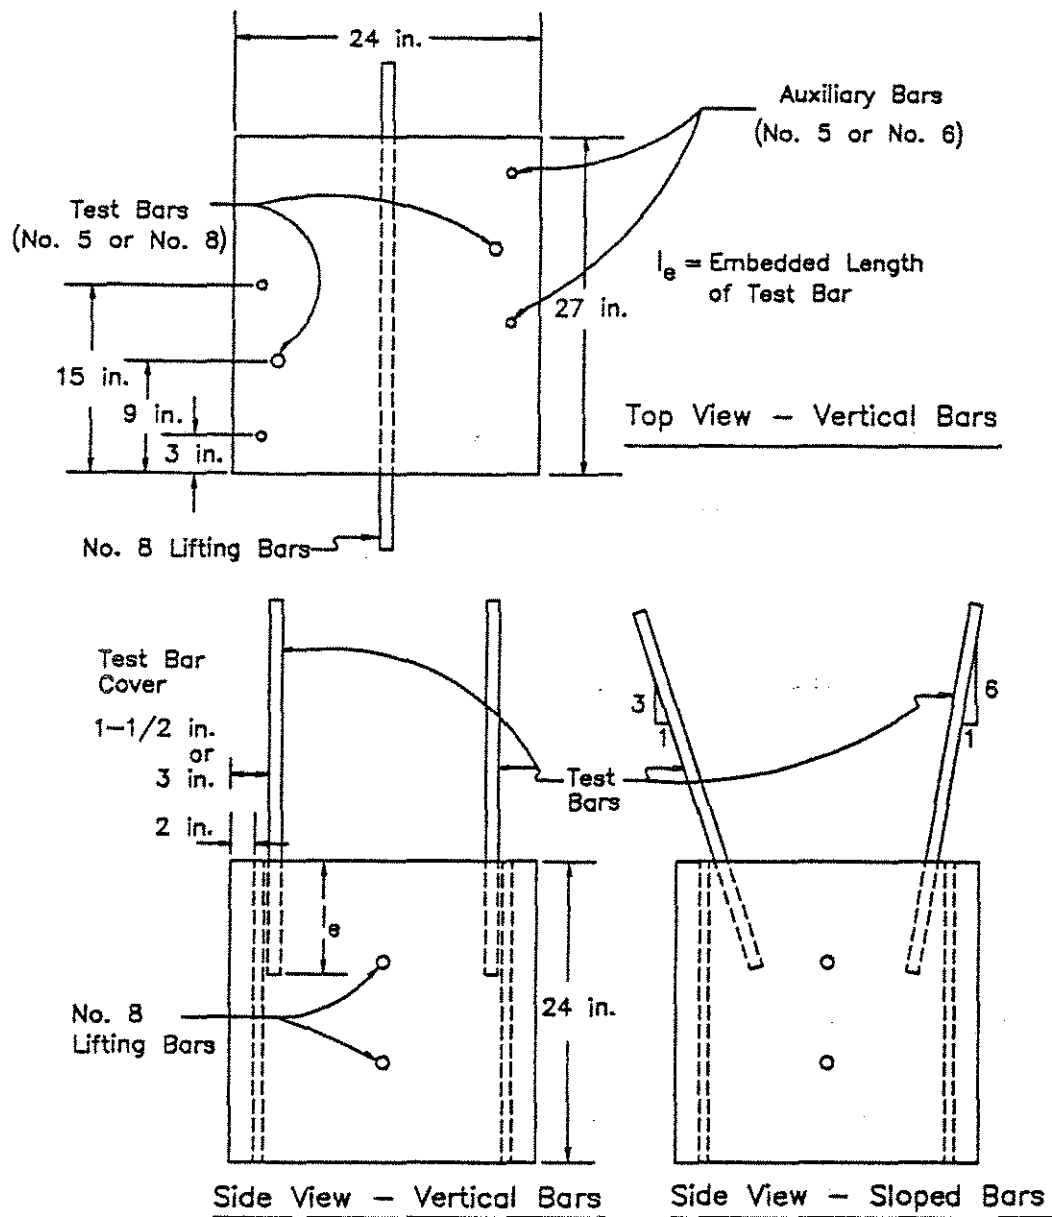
Test Specimen with Vertical or Sloped Bars as Cast
